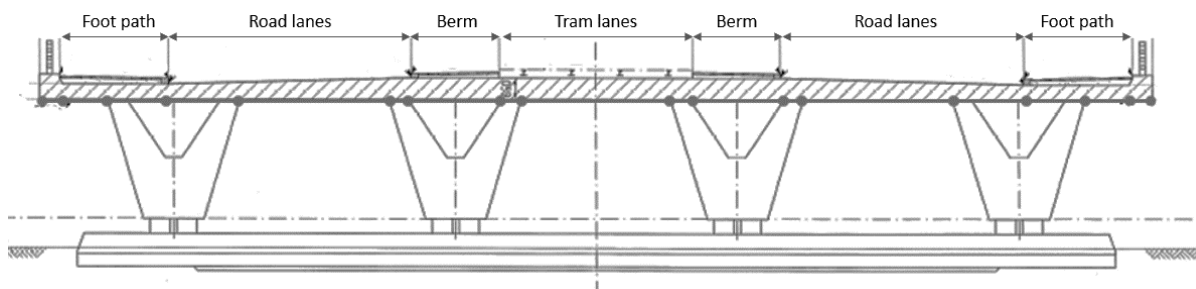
Cross-section view of Bridge 705 (Rózsás, et al., 2022).
